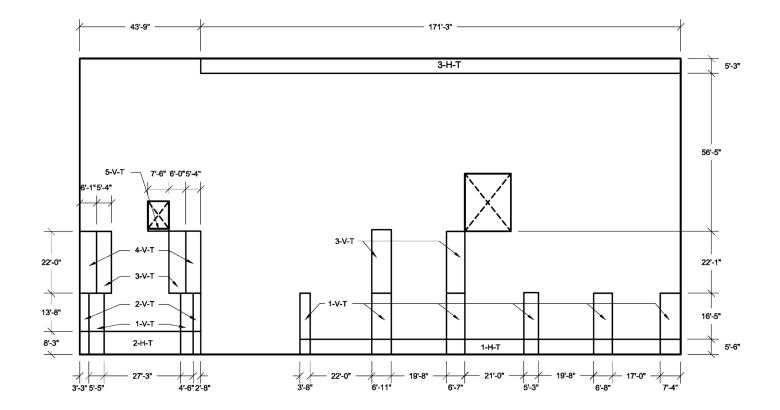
H.3-12 North Wall Looking South Transverse Reinforcement Zones
